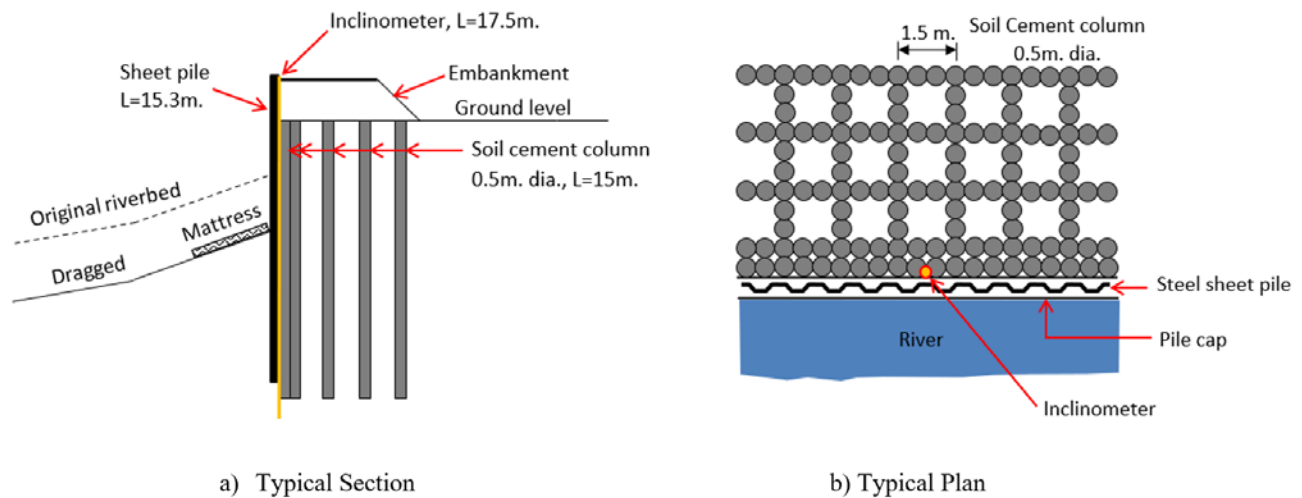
The typical cross section of deep mixing of cement admixed clay improved river bank
